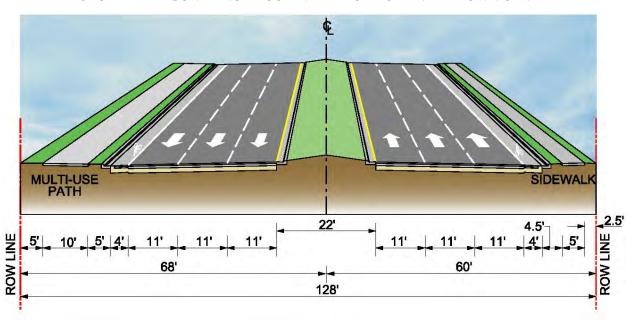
SIX-LANE DIVIDED URBAN TYPICAL SECTION THROUGH PROMENADE TOWN CENTER
